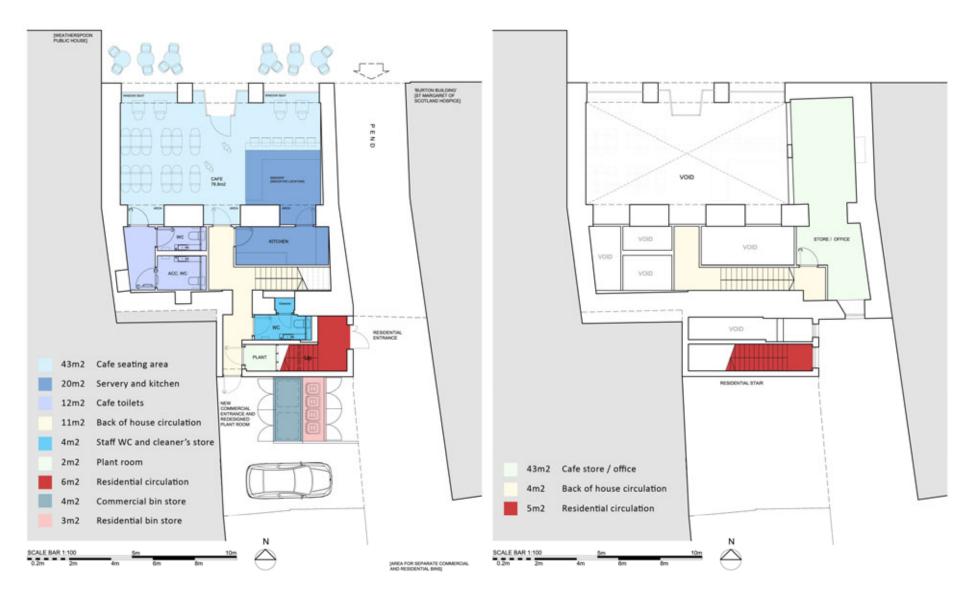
Ground floor plan – as proposed. Approx 35 covers
